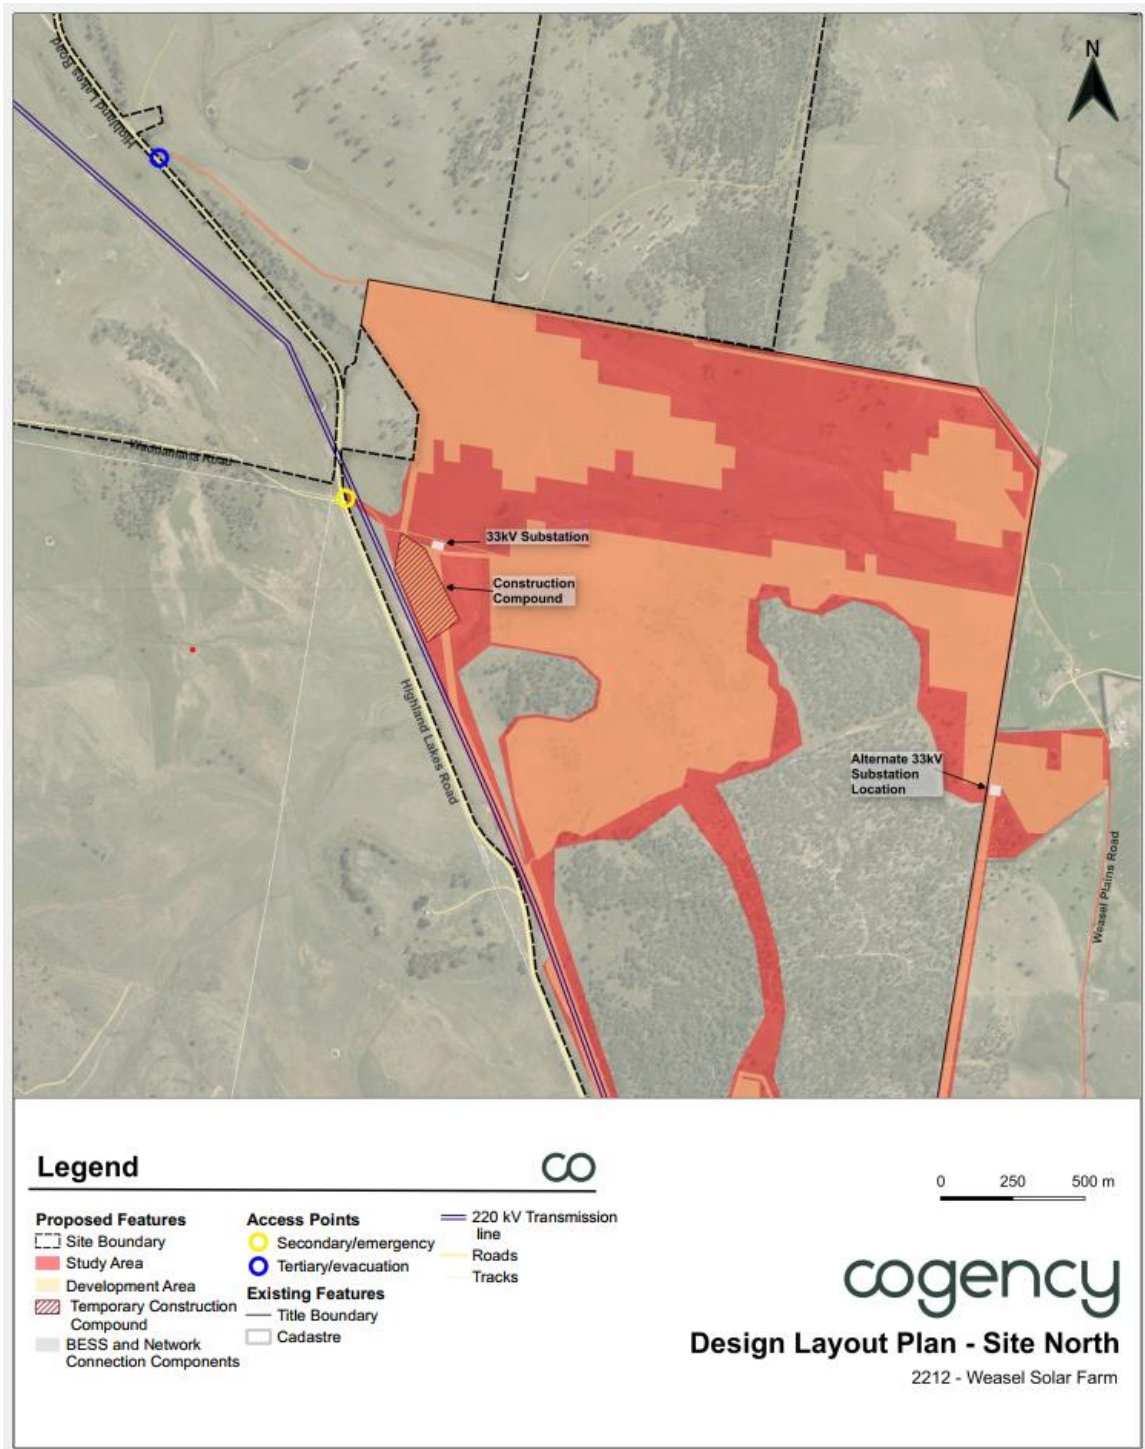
WSF Design Layout Plan - Site North (source: Cogency)
